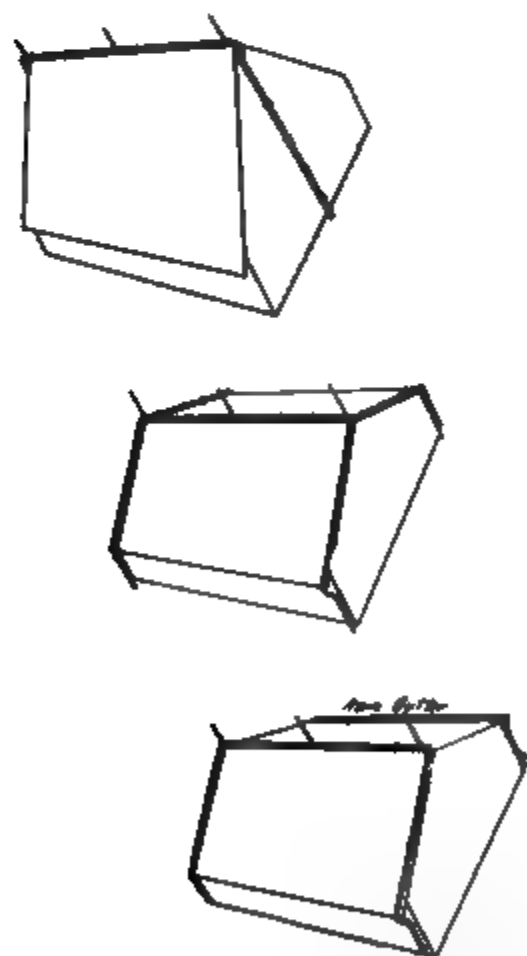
A steep roofed building needs no conductors at the eaves. If the roof is flat, the eaves need protection, especially at the corners. The rain gutters may be sufficient protection for the eaves.
